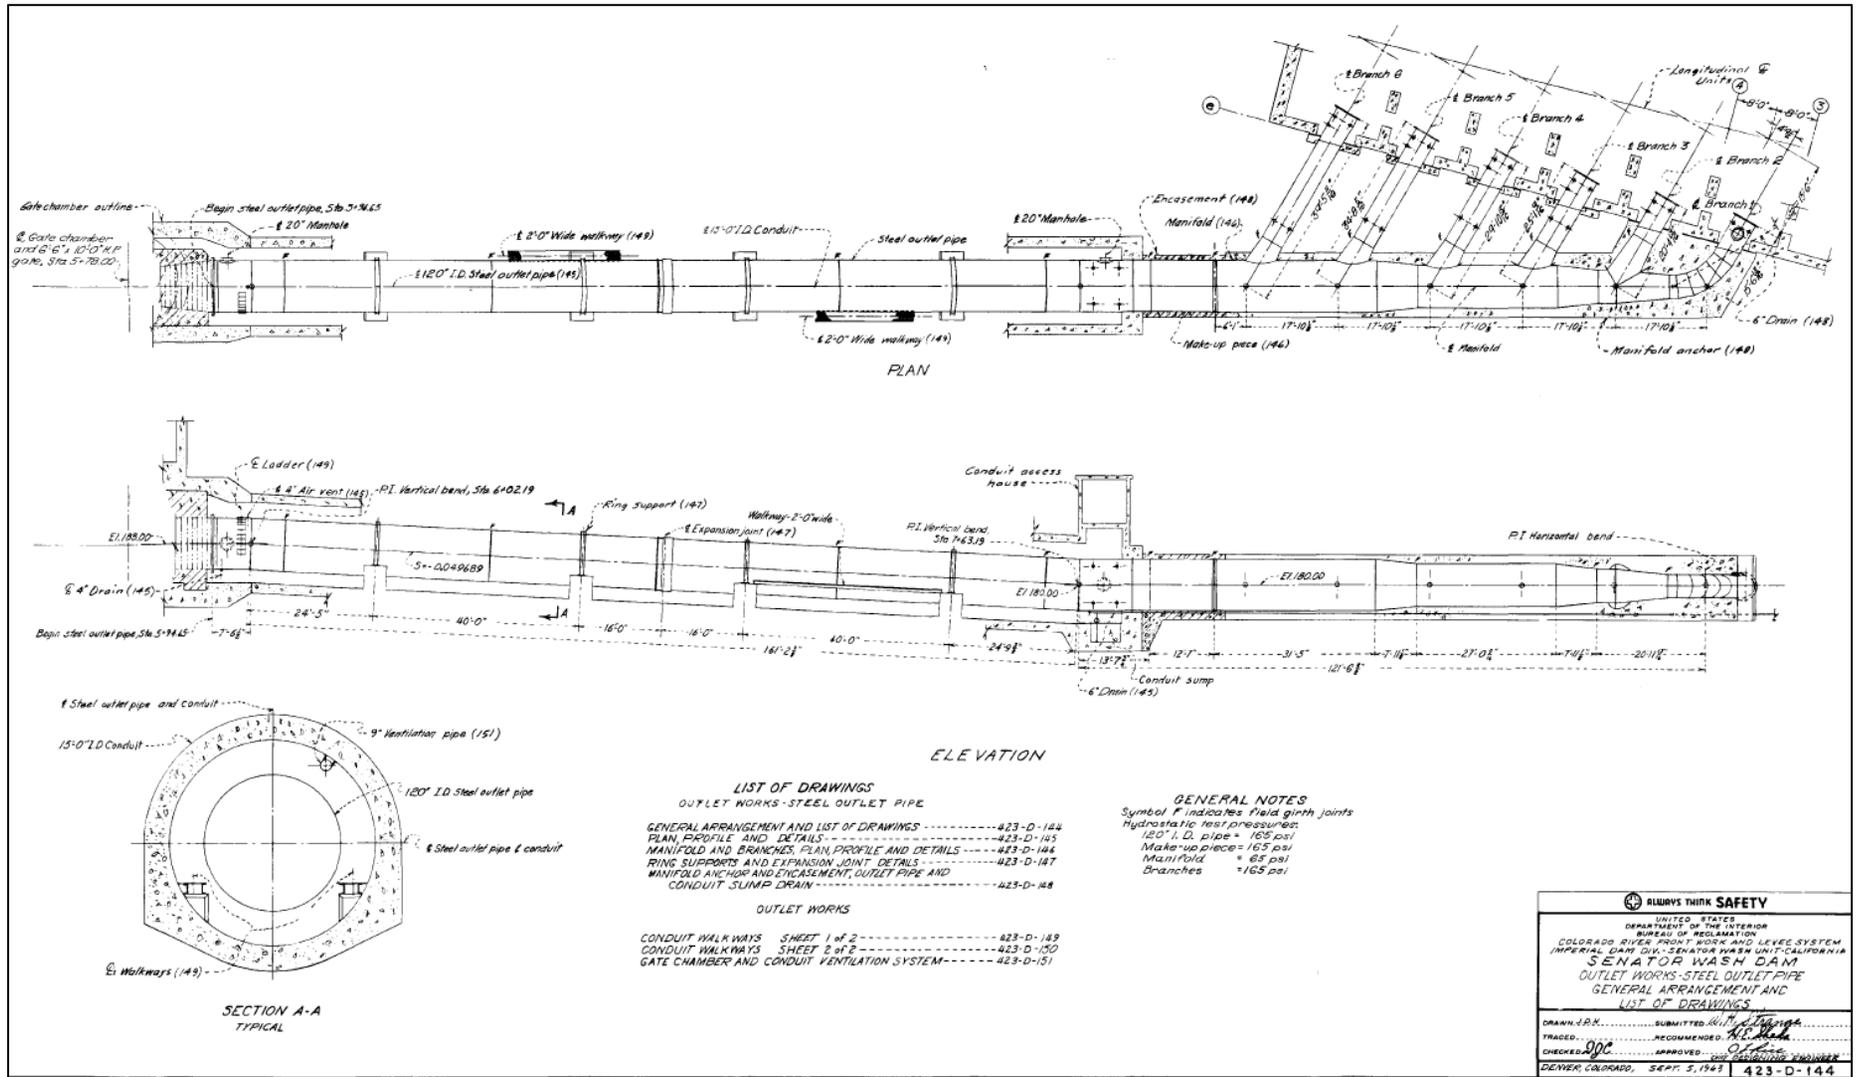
Drawing 423-D-144, showing Plan and Elevation views of Senator Wash Penstock.
